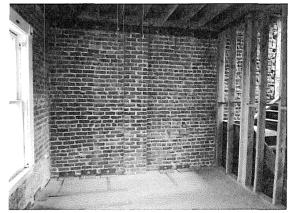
Interior photograph of exposed brick at south wall, fifth floor. Note minor efflorescence and deterioration of mortar (photograph taken on 02/27/2018).
